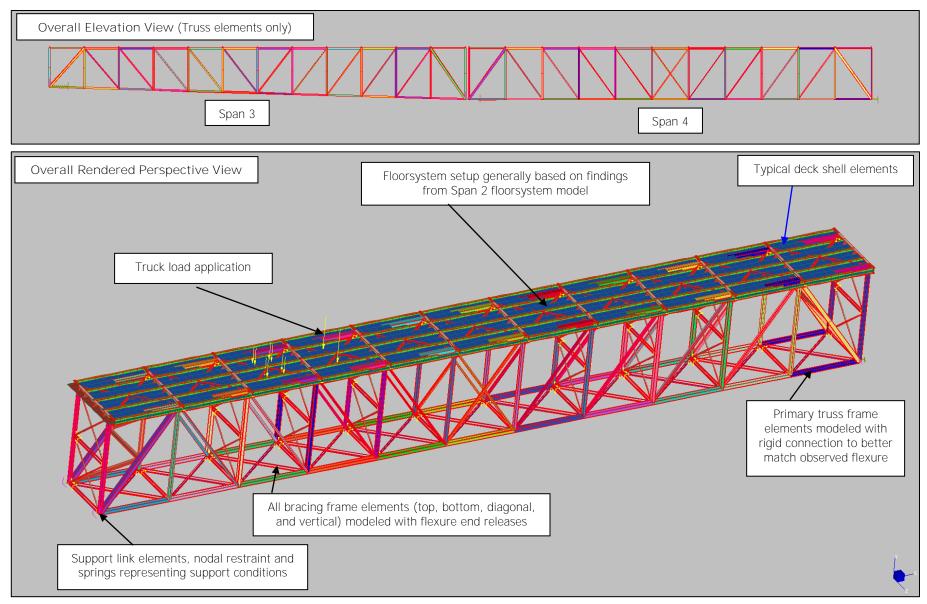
Model Overview of Span 4 Truss FEM illustrating test truck on the bridge
